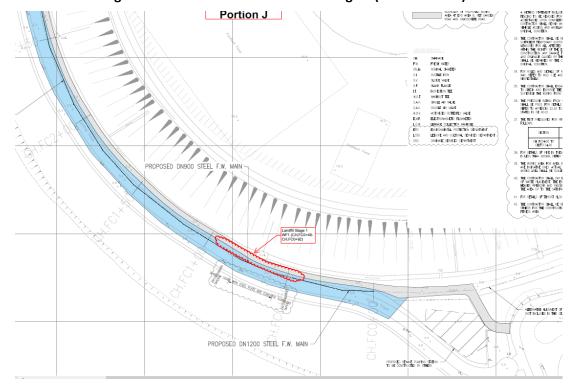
Location Plan - Landfill Stage 1 (Area FC0+42 -FC0+92)
